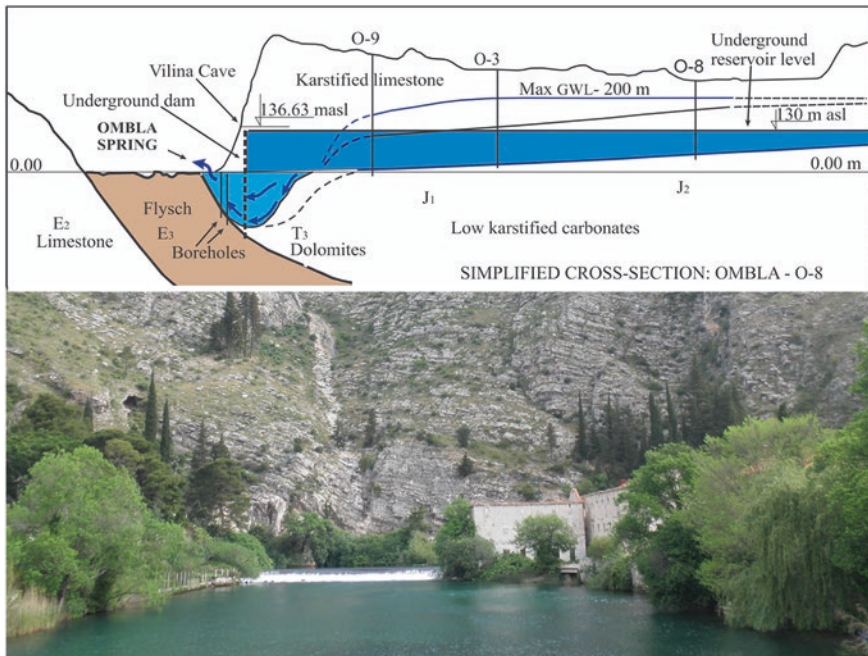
Ombla underground dam, Croatia (general idea). Simplified cross-section along the underground reservoir (*upper*), and Ombla Spring (*lower*). *Sketch and photo P. Milanović
